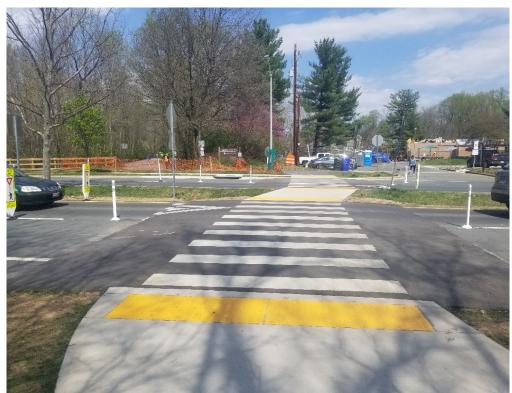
Raised Crosswalk and Road Diet at CCT Crossing
